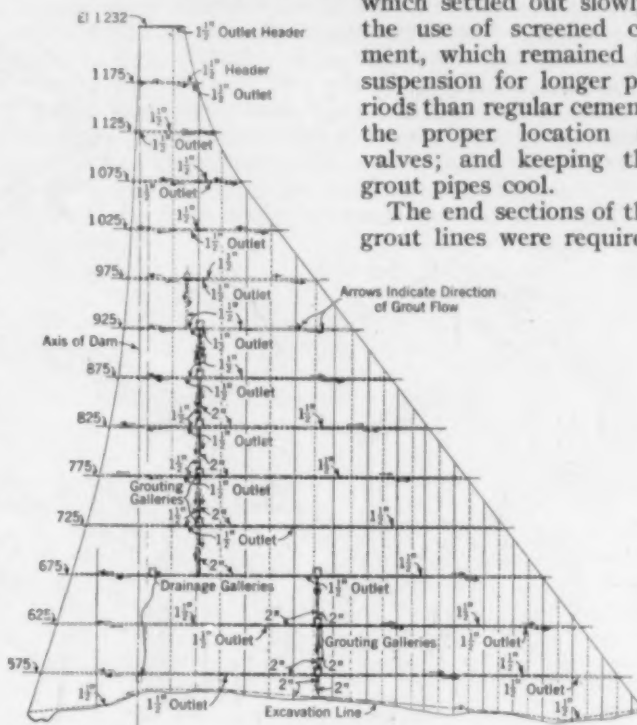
SECTIONAL ELEVATION OF BOULDER DAM
